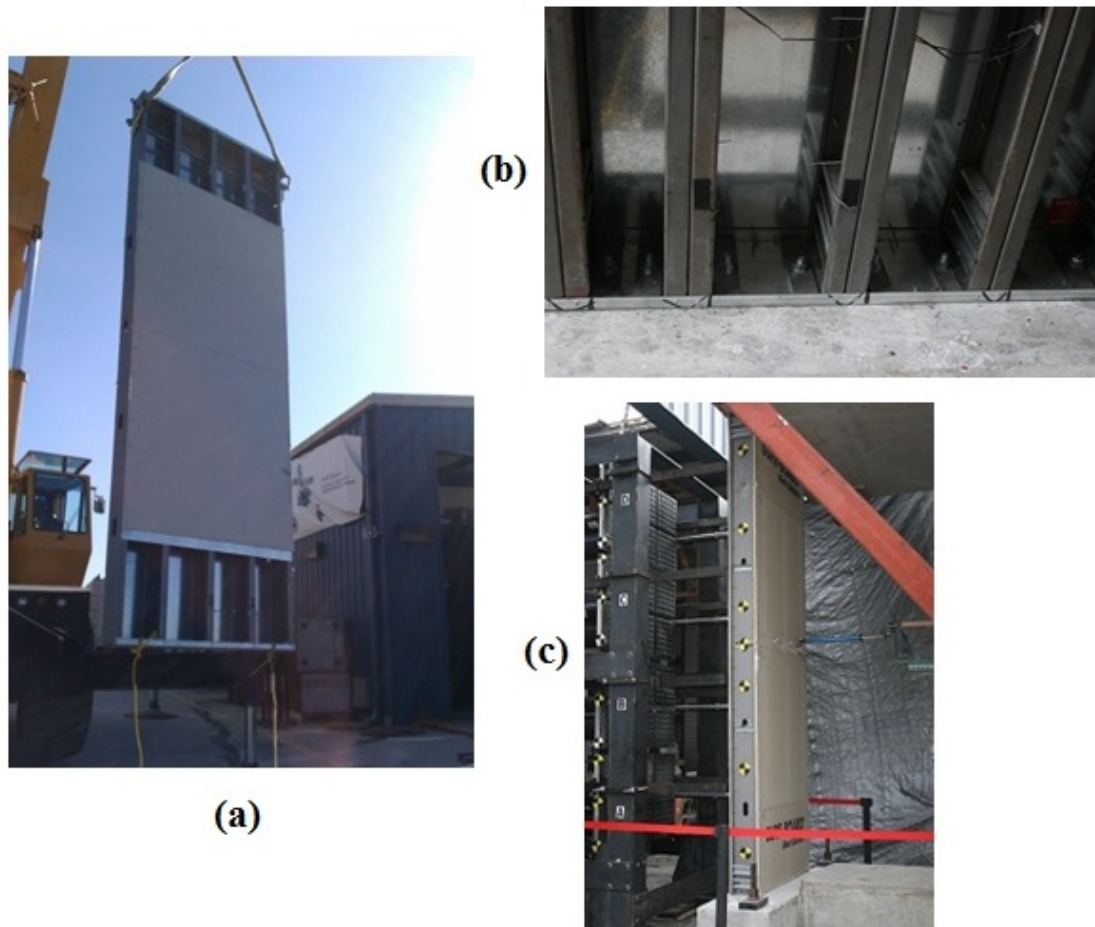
(a) Placement of specimen with access to connections (b) Blast-washer connection (c) Completed wall
